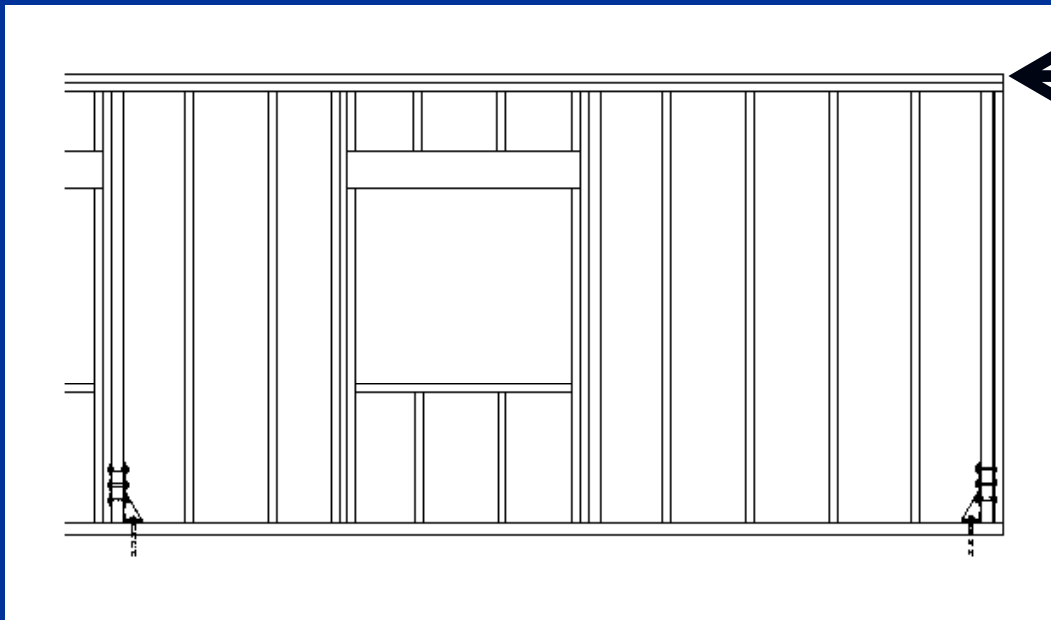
DETAIL BOUNDARY MEMBERS FOR FORCE TRANSFER AROUND OPENING, TYPICAL
